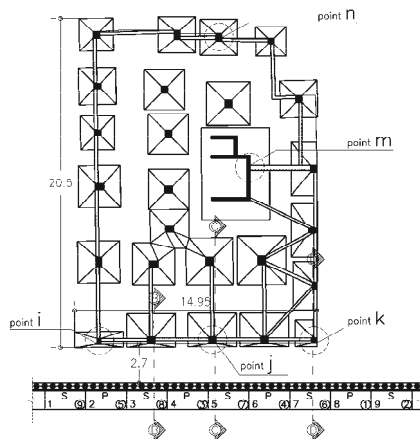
Individual footings of a 6-storey building together with the diaphragm wall and the micropiles
